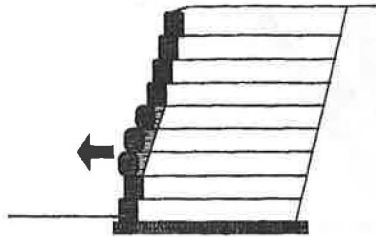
Shear Failure (Bulging) - Parts of the wall are being pushed out due to local instability.
